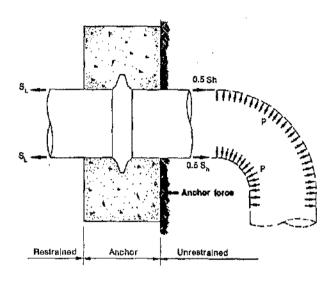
Anchor force, from anchor installed to limit end move-REMEMBER: UNRESTRAINED portions can have significant bending stress
